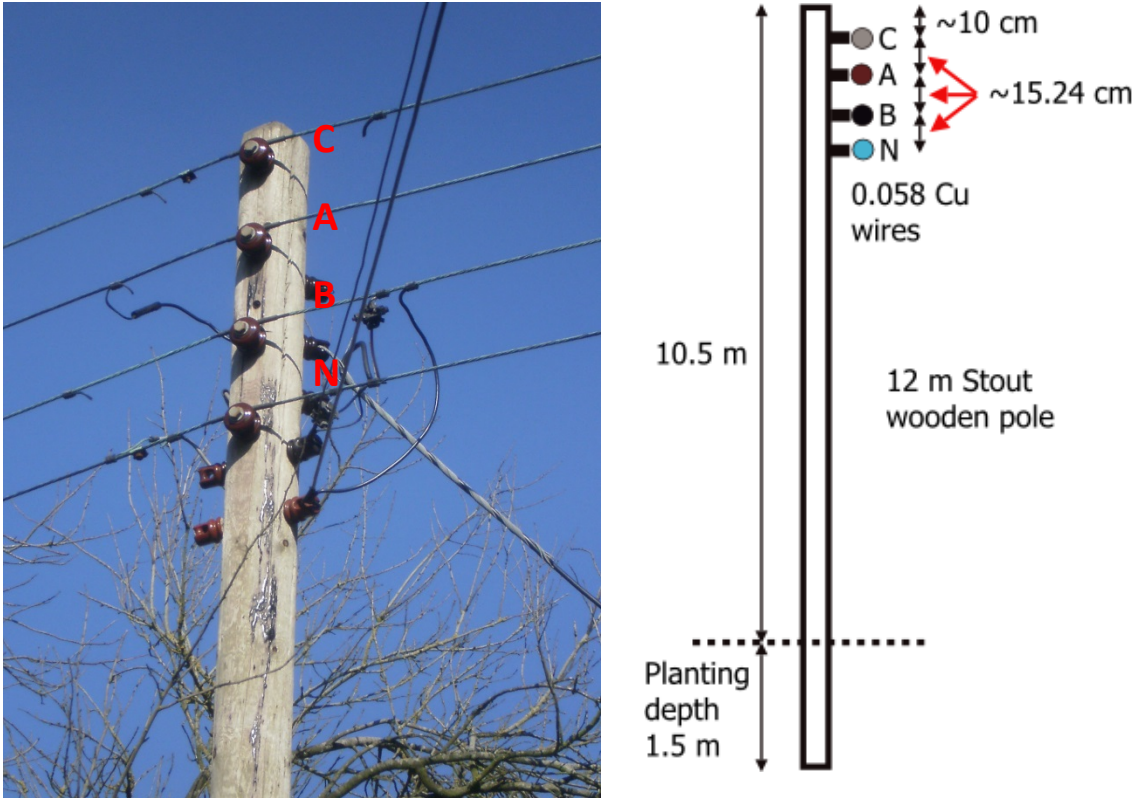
Photo of pole #13 and sketch showing its construction details
